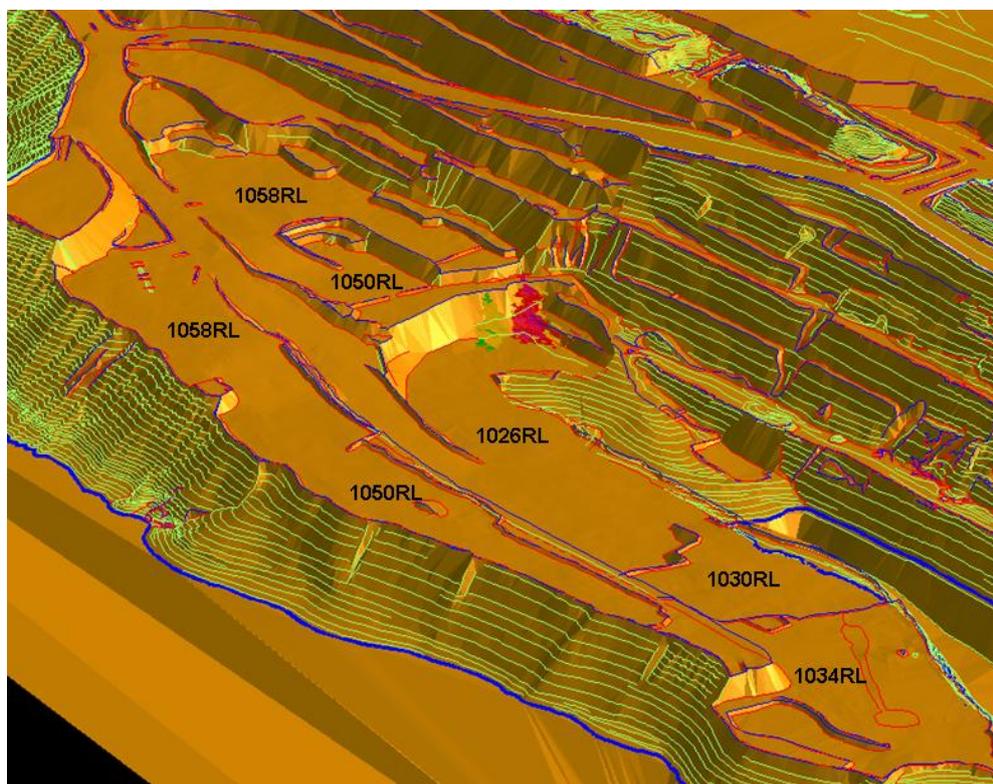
Bench development of Stage 1 Main Pit at the end of December looking north west
